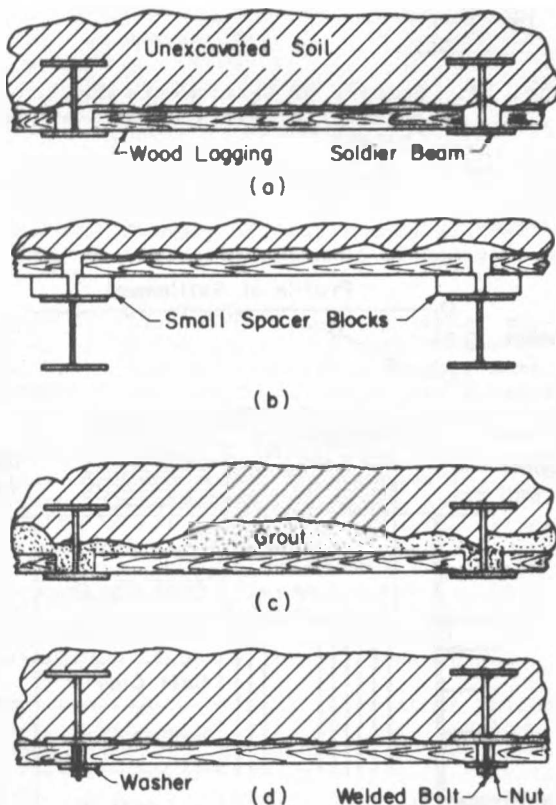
Methods for Transferring Earth Pressure from Lagging to Soldier Piles; (a) Lagging Wedged Against Inside Flanges of Soldier Piles; (b) Lagging Set Behind Outside Flanges of Soldier Piles; (c) Grout or Mortar Filling Between Lagging and Soil; (d) Contact Sheeting
